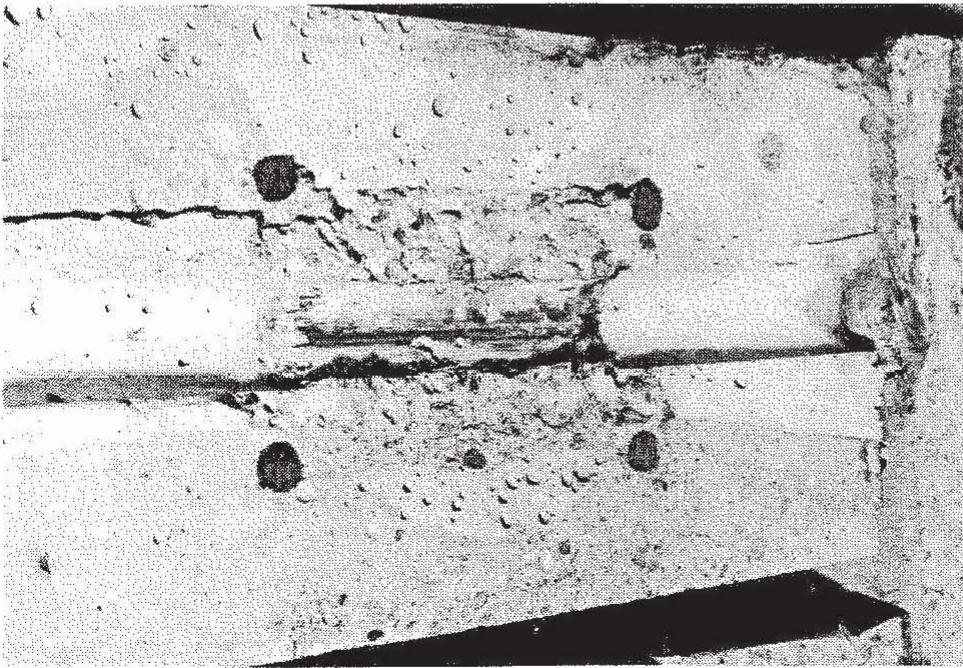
PHOTO OF SAWN SPECIMEN AFTER TESTING. FAILURE BY PULLOUT.
